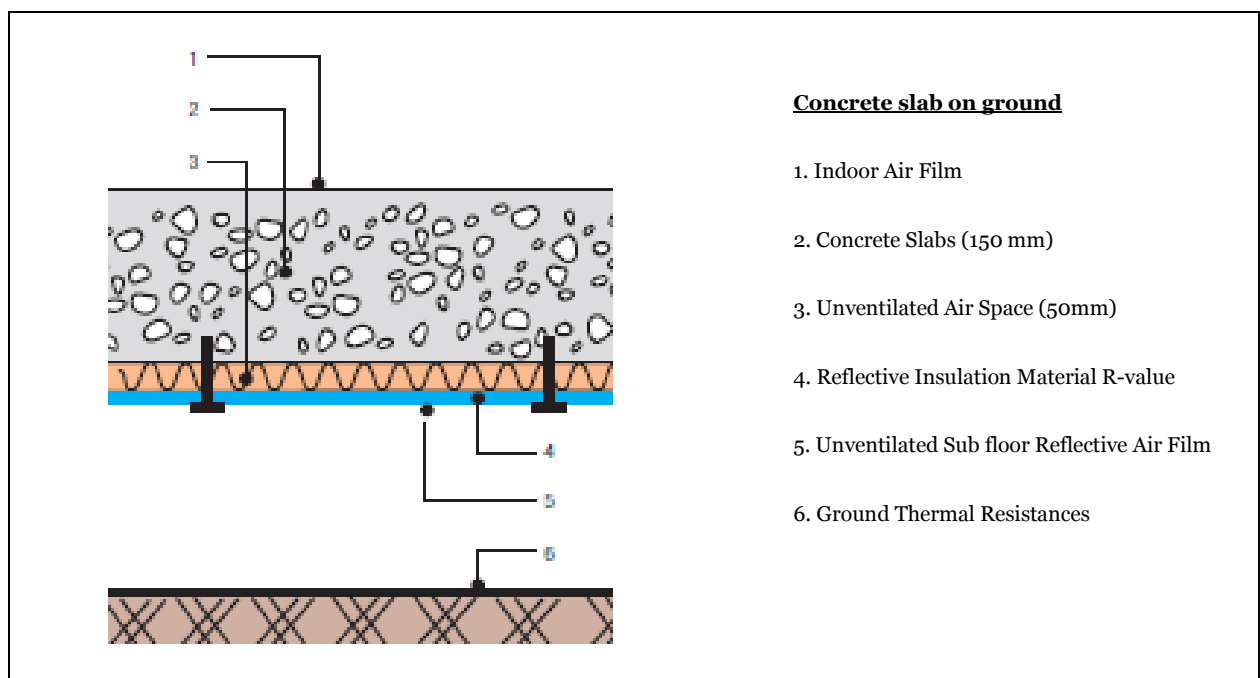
Concrete slab on ground (ICANZ 2009)
